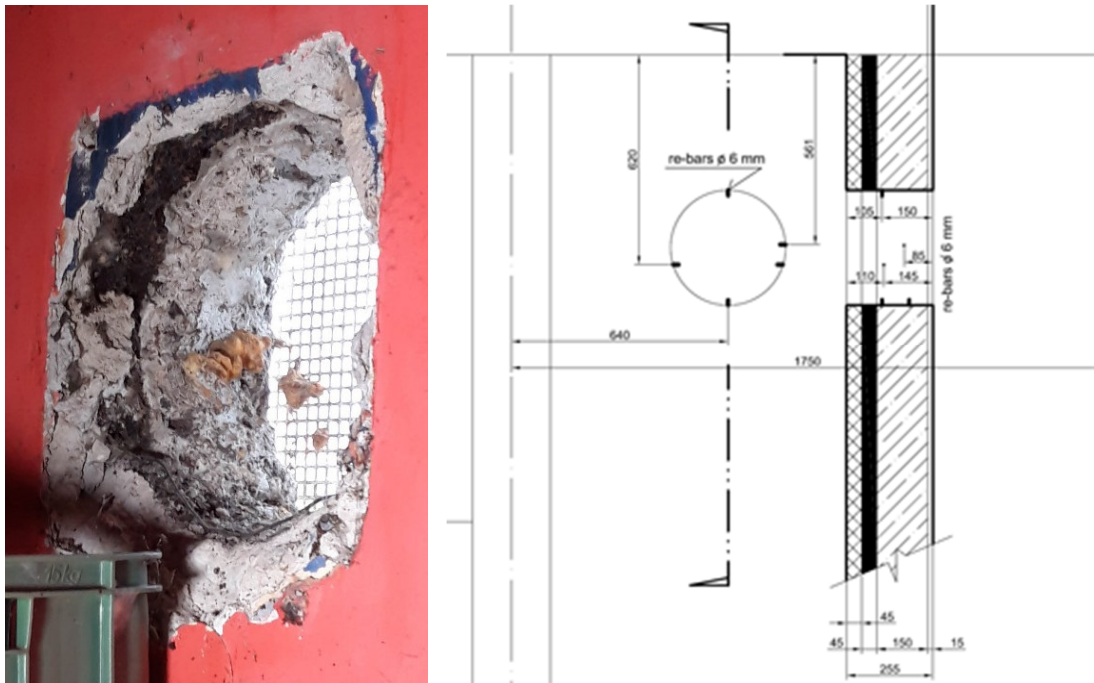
Detail of the ventilation hole on the lintel wall and cross-section drawing of its layout.
